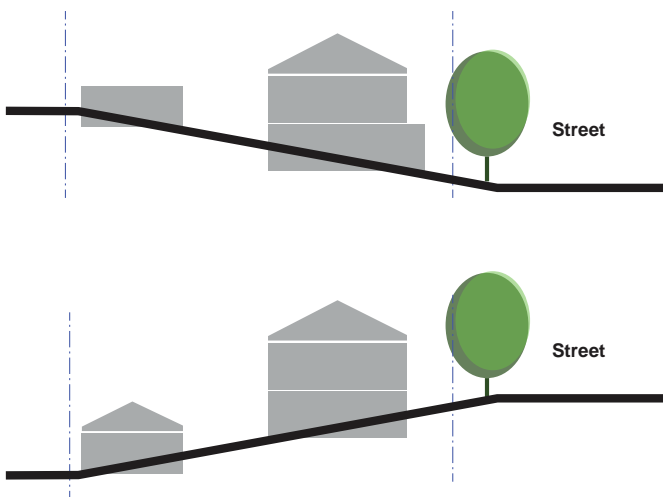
On both uphill and downhill lots, coach houses need to consider massing implications from the fronting street and the lane, and seek to minimize excavation and exposed foundation walls.
